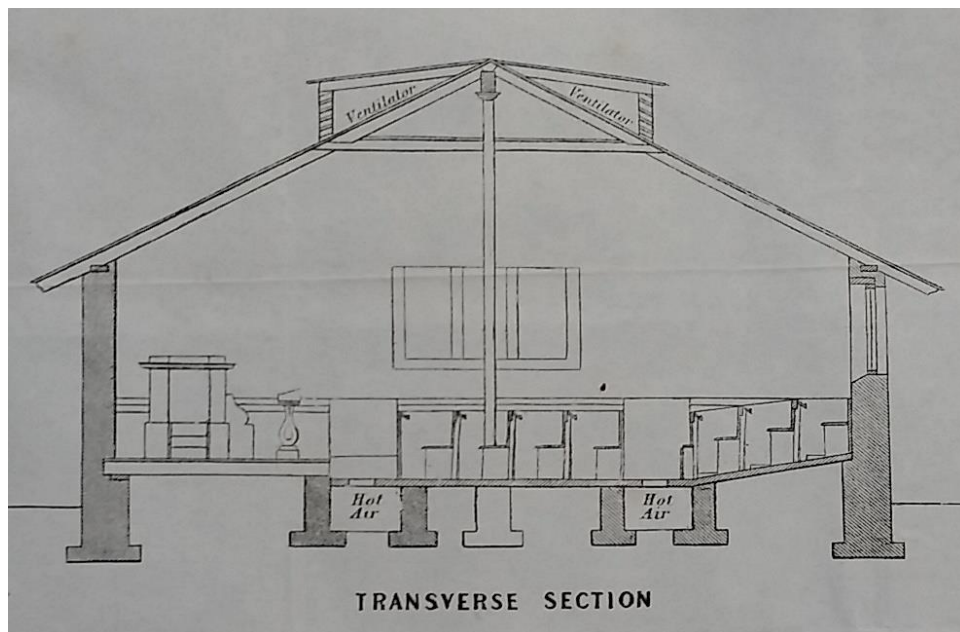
A Transverse Section of the Smallest-sized Church with Ventilation and Heating (Cousin & Gale, architects, 1843)
